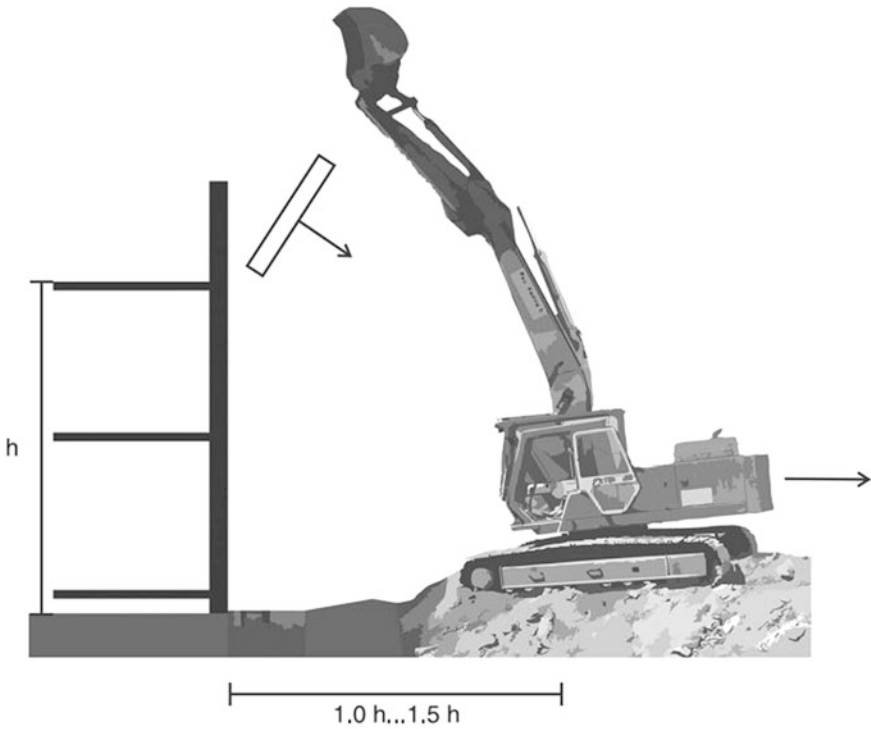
The excavator pulls on a wall (Kamrath 2013)
